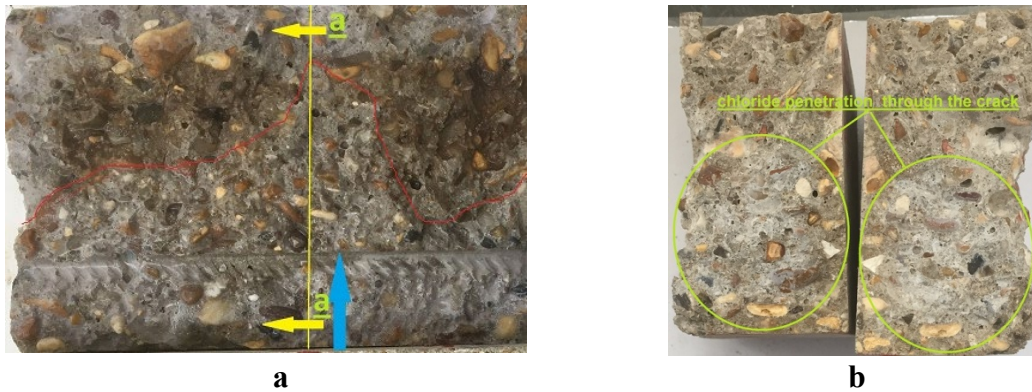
Chloride penetration through the crack, (a) longitudinal section in the crack, (b)
